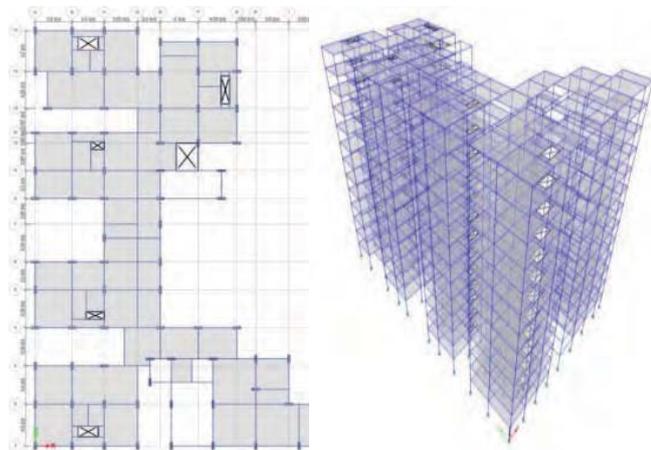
Plan and Isometric view of case-1(Existing building plan)
